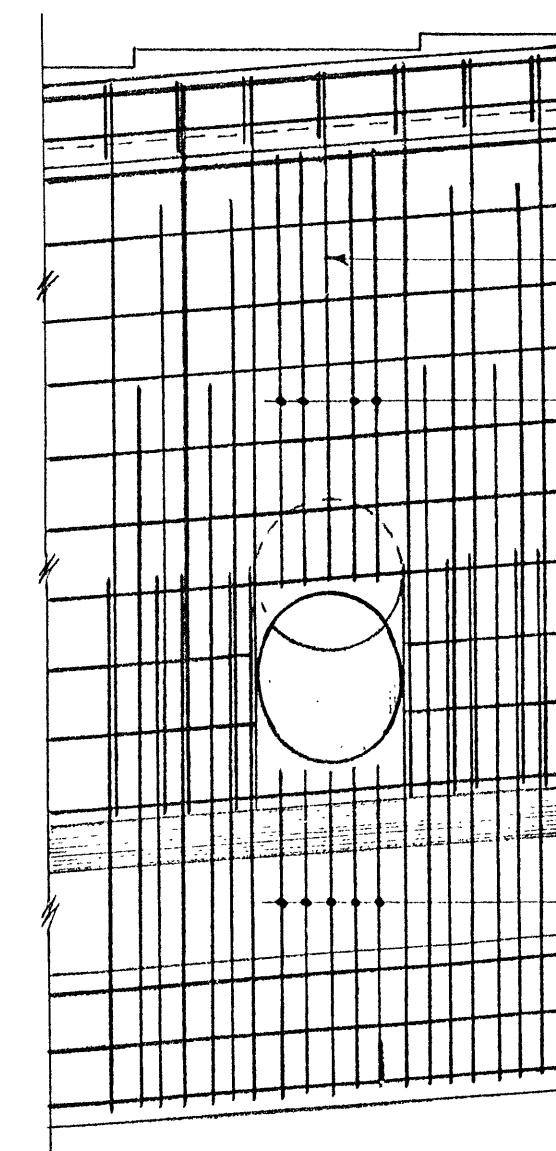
DETAIL OF REINFORCEMENT AT INSPECTION PIPE FOR SECTION B-B (5 Req'd.)
